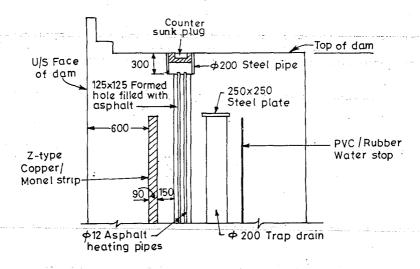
Sectional plan at a contraction joint (square hole shows location of asphalt water stop)
